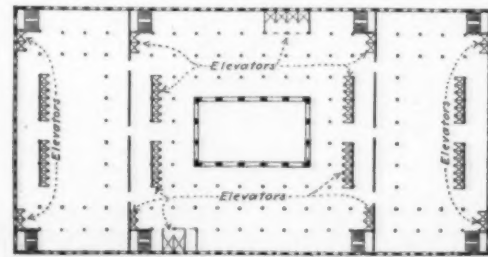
Suggested arrangement of fire walls, elevators and stairs for department store.
